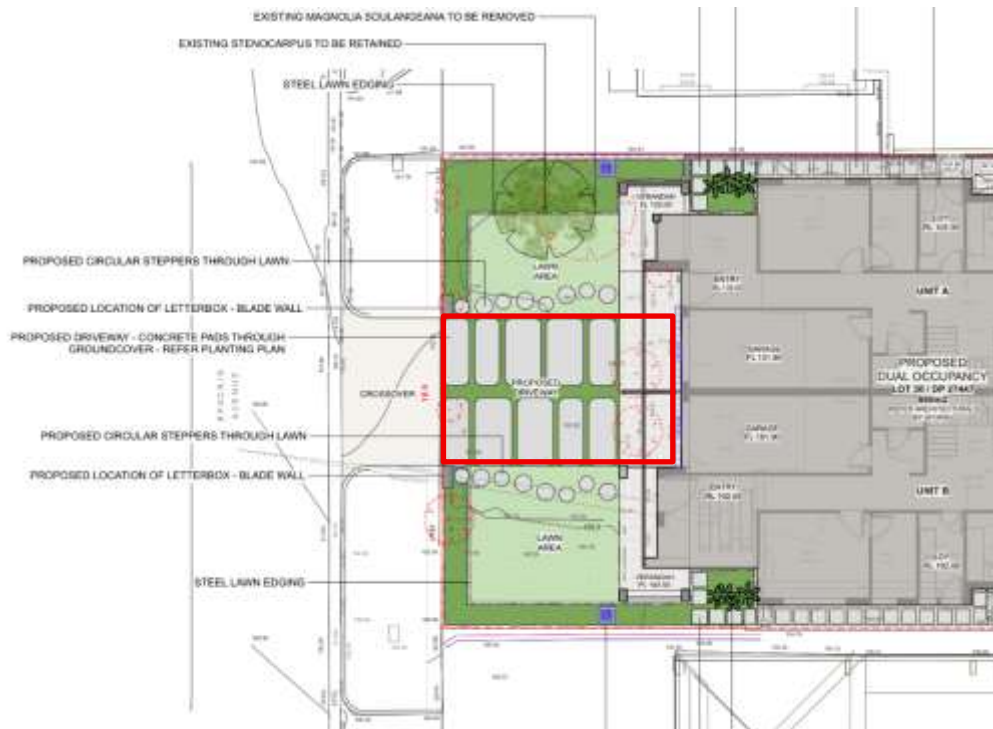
Landscape plan of the proposed development with extent of concrete pads with ground cover outlined in red (Source: Contour, 2025 with Planwave edits.)
